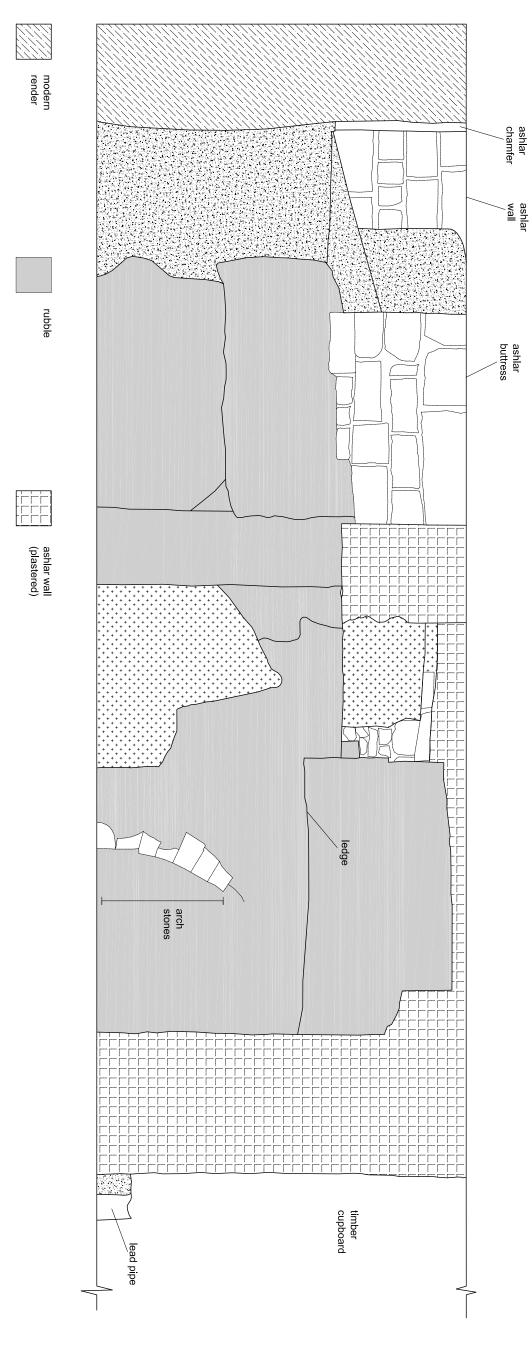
Elevation of masonry features in the Phene Neal Room, looking west
